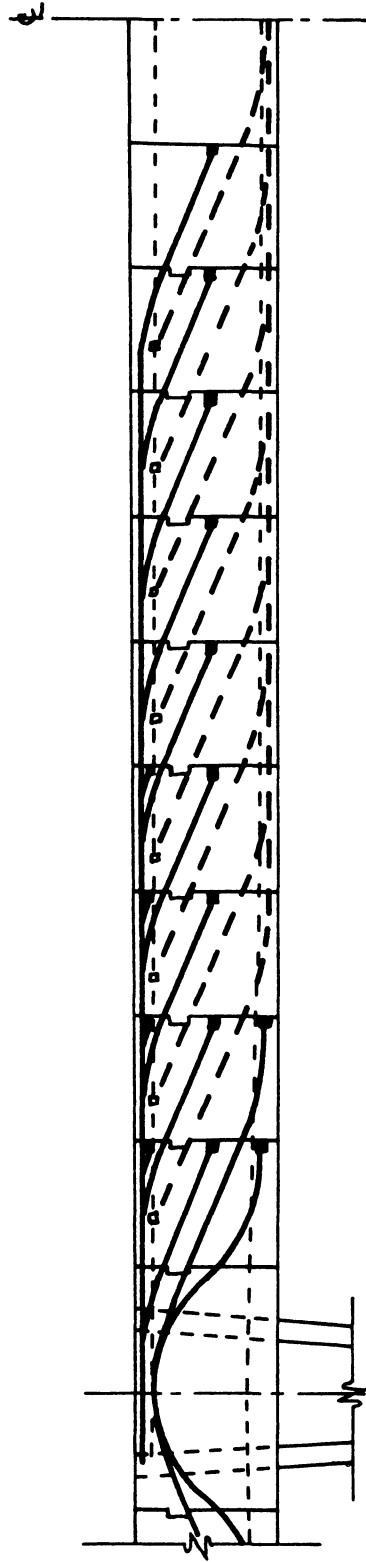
Choisy-le-Roi Bridge — longitudinal cable profile.
